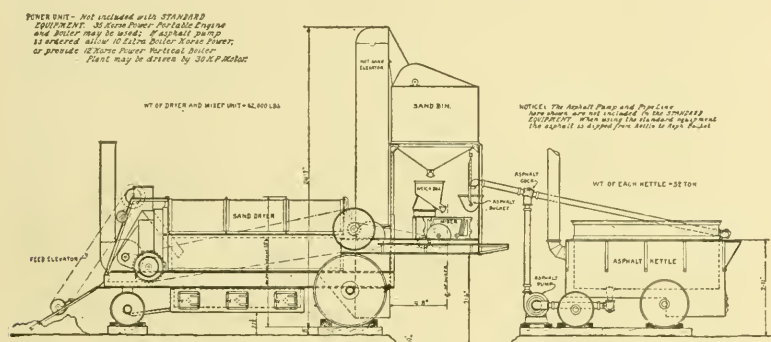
Portable plant with 9-cu. ft. pug mill mixer.
